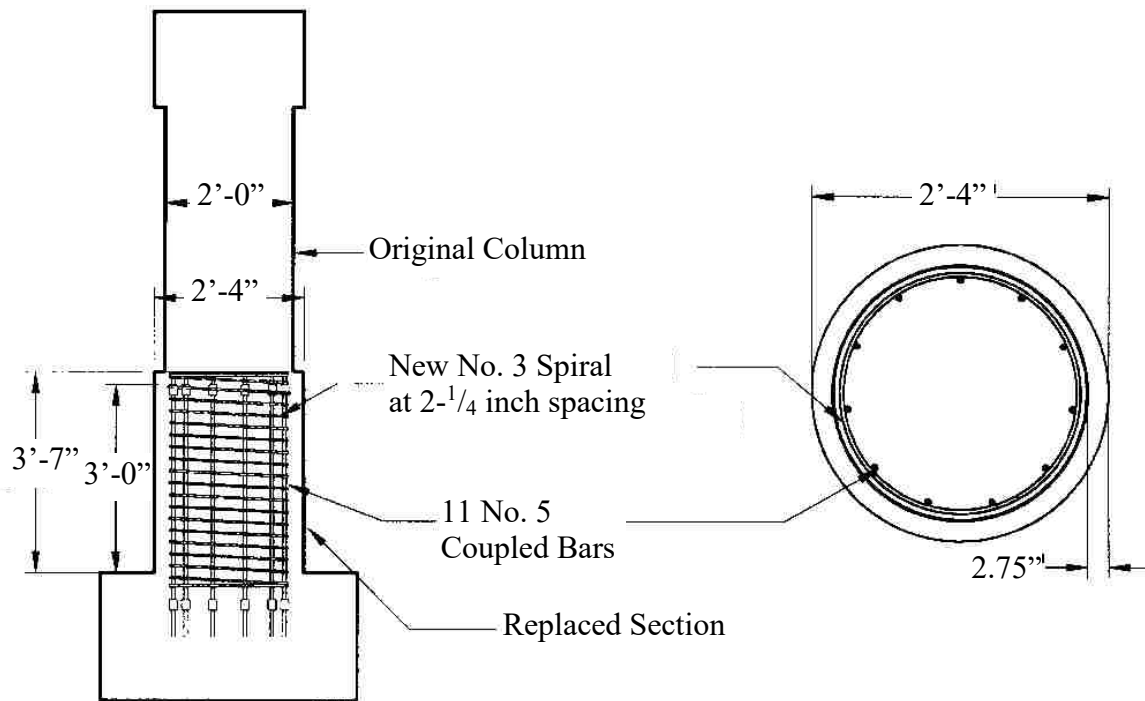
Repair Design for Column 407S (Repaired Designation 407SR)
